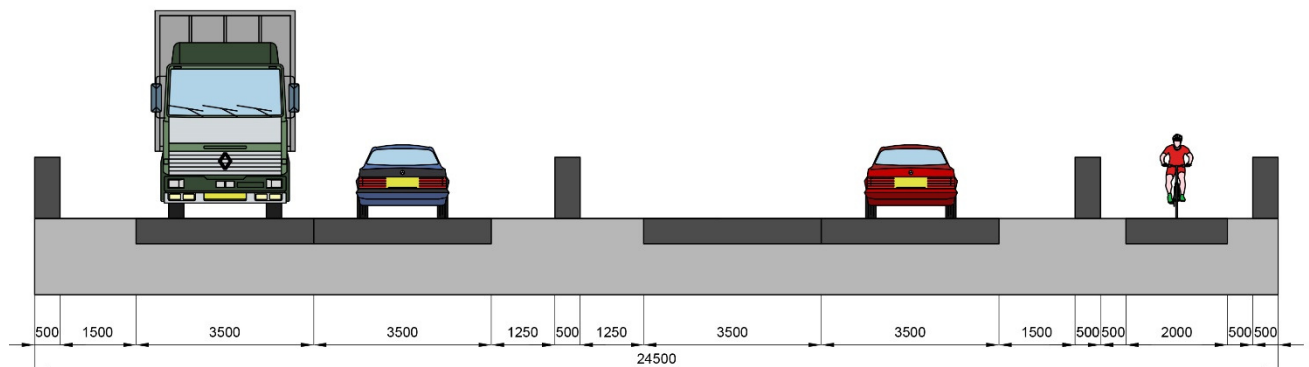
PROPOSED LAYOUT OF THE ROAD ON TOP OF THE SOGNEFJORD BRIDGE
